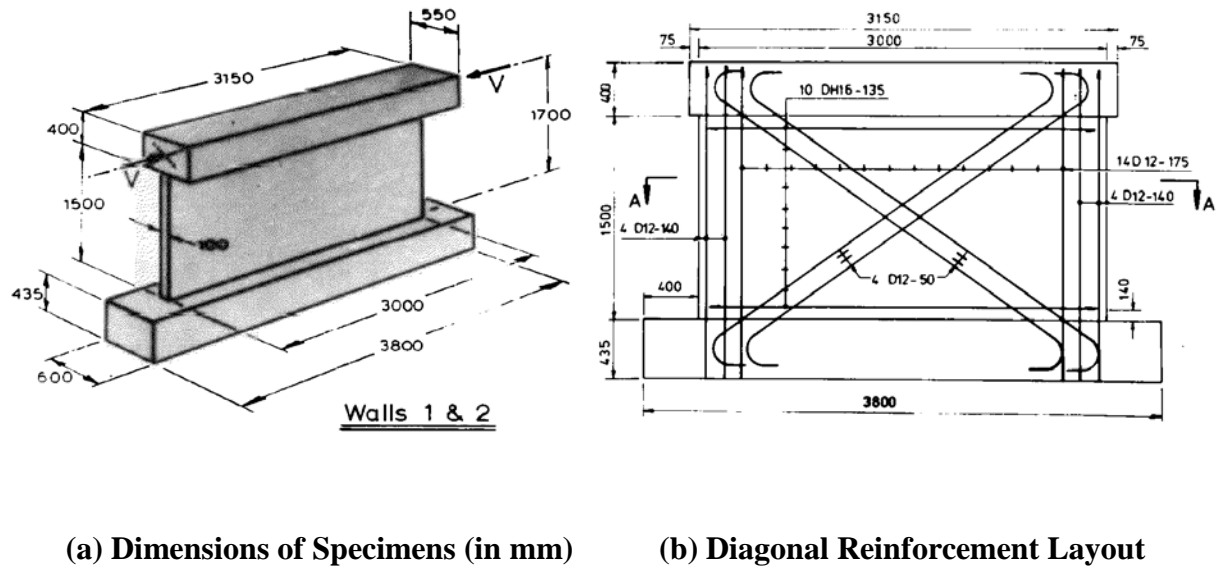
Low-Rise Wall Specimen Details in the Study by Paulay et al. (1982)
